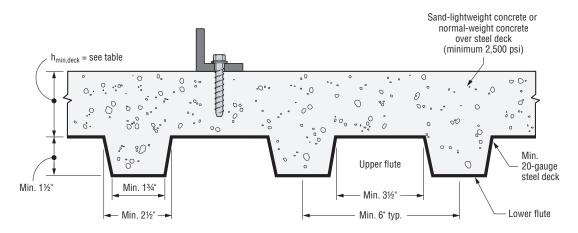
Installation of ¼"-, %"- and ½"-Diameter Anchors in the Topside of Concrete over Steel Deck
